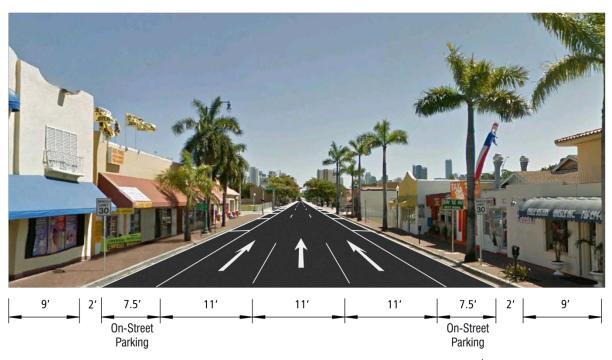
Existing Roadway Typical Section of Eastbound SR 90 (SW 8th Street)
